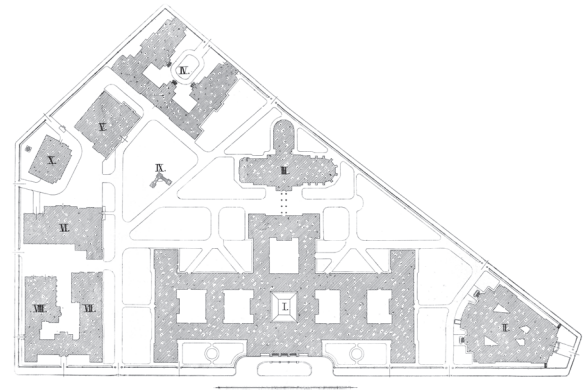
The site plan of the erected campus of the Technical University, 1909. (After Hauszmann [12, p. 2] [13, pp. 266-267]) I. Központi épület. Central Building (Hauszmann, plans 1905-06, built 1906-09). II. Kémiai épület. Chemistry Building (Czigler, plans 1897, built 1902-04). III. Könyvtárépület. Library Building (Pecz, plans 1905-07, built 1907-09). IV. Fizikai épület. Physics Building (Czigler, plans 1902-04, built 1904-06). V. Géplaboratórium. Engines Laboratory (Pecz, plans 1905-07, built 1907-09). VI. Mechanikai Technológia. Mechanical Technology Building (Pecz, plans 1905-06, built 1907-09). VII-VIII. Műszaki Mechanika és Mezőgazdasági Géplaboratórium. Applied and Agricultural Mechanics Laboratory (Pecz, plans 1905-07, built 1906-09). IX. Geodéziai obszervatórium. Geodesic Observatory (Hauszmann, 1909). X. Kazánház. Boiler-House (Pecz, plans 1905-06, built 1907-09). [1]
